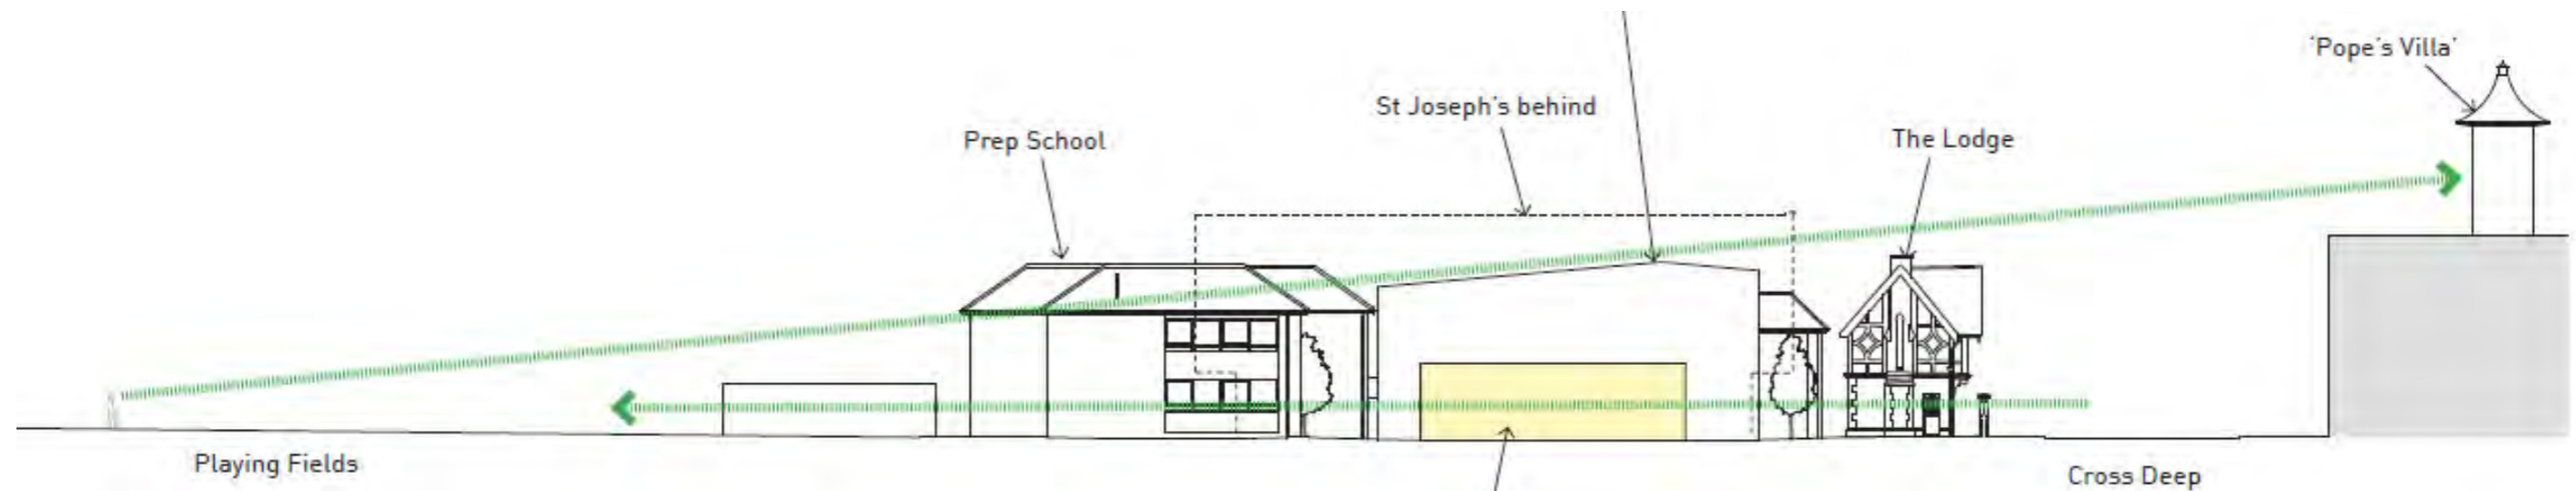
Proposed New Scheme demonstrating design concept to allow intervisibility between the playing fields and Cross Deep (Source: Tim Ronalds Architects)
